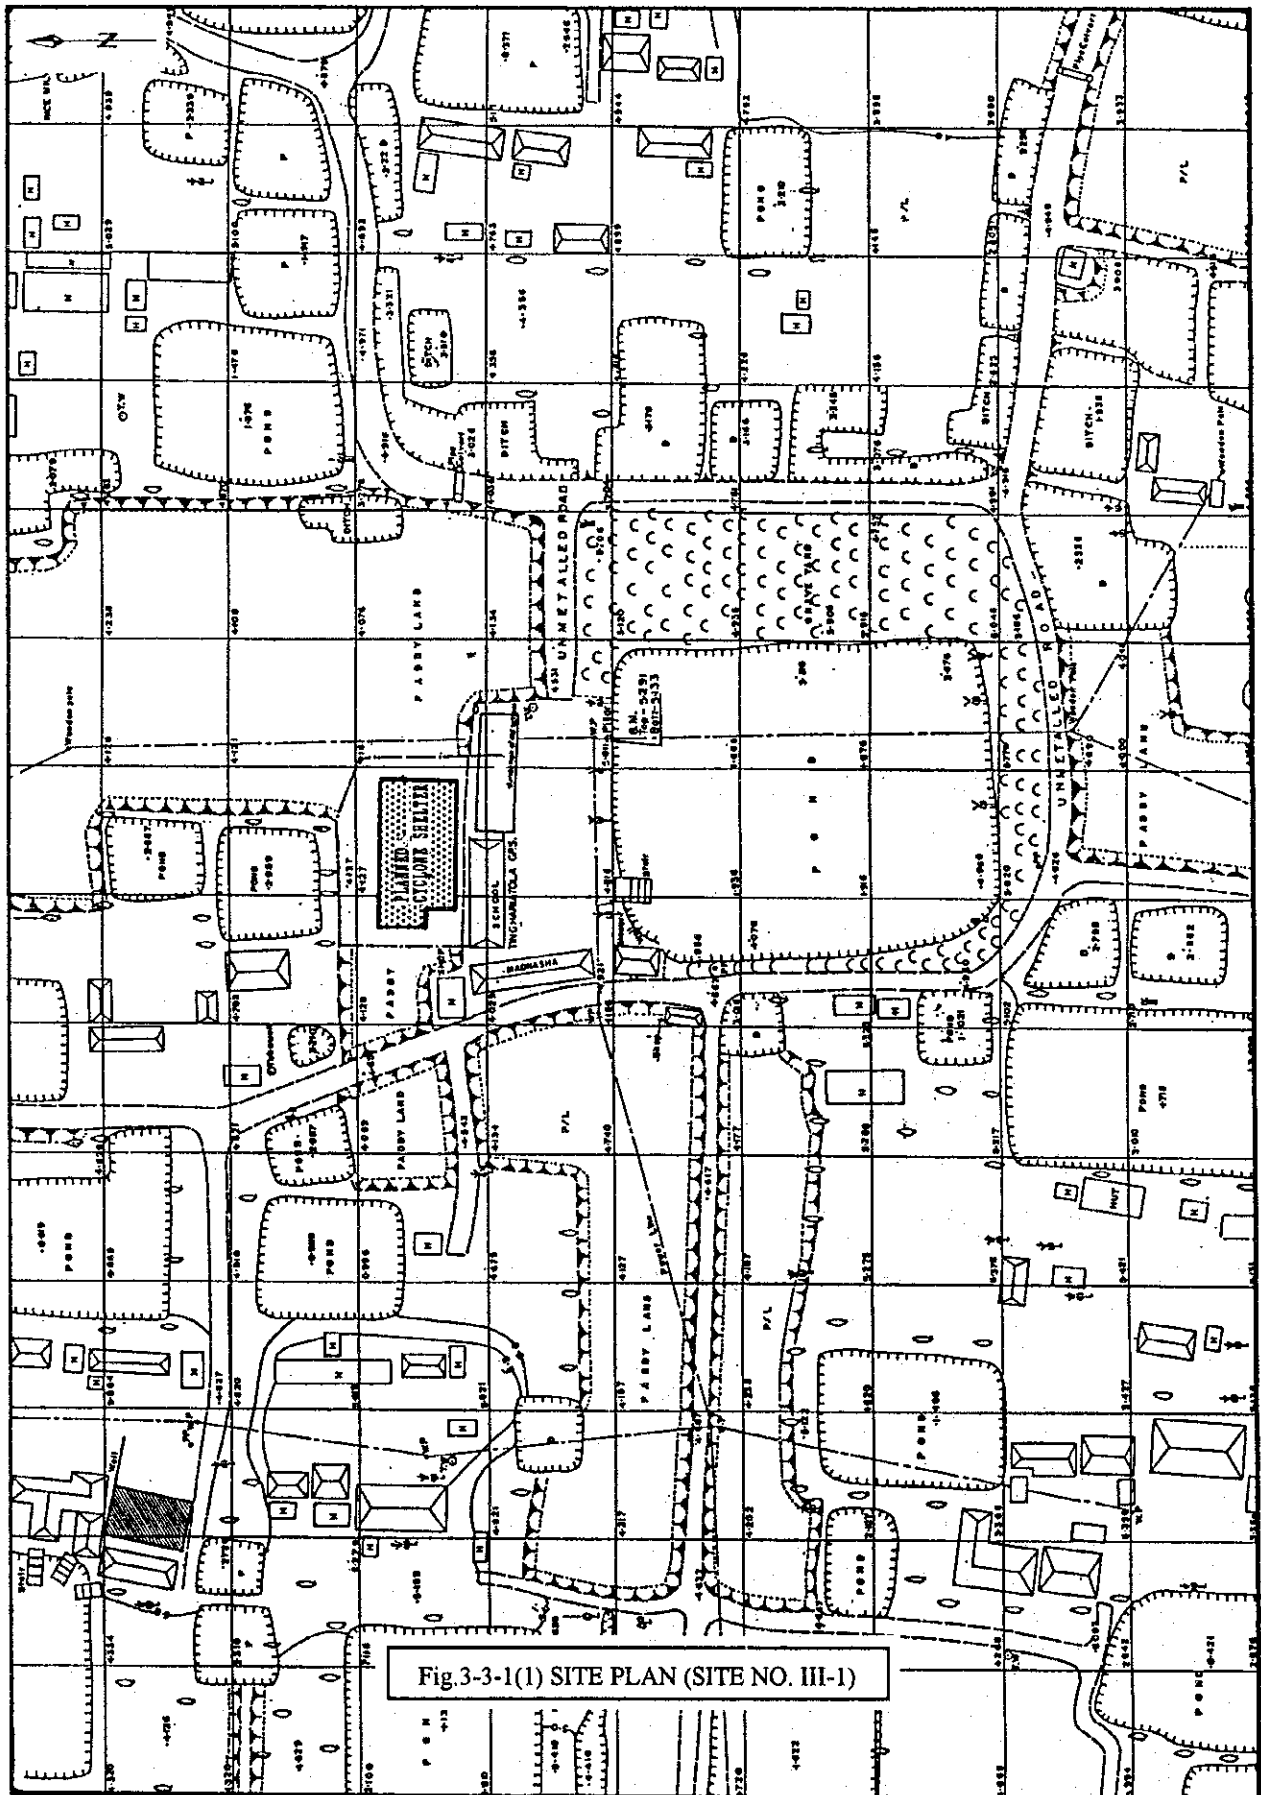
(1) SITE PLAN (SITE NO. III-1)
